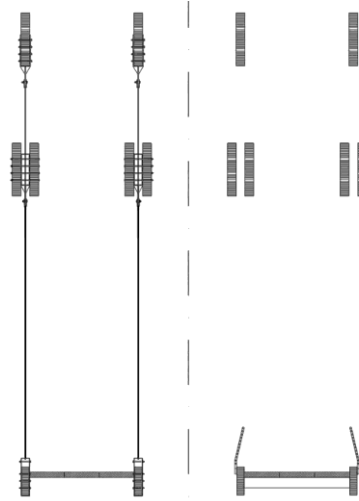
(a) Section with Hangers-Deck-Arches Connection; (b) Section with Deck-Lateral Barrier and Triple Arch.
